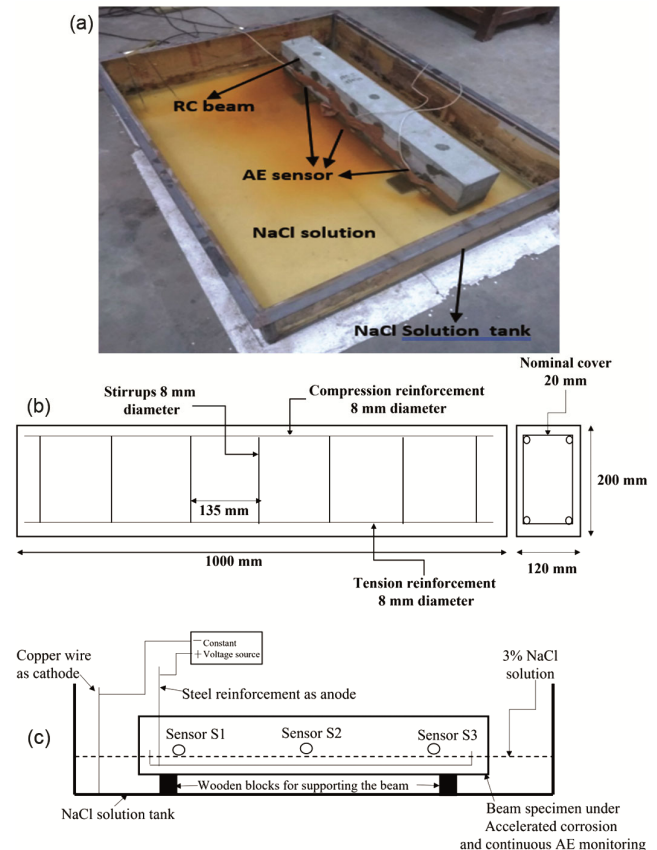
(a) Accelerated corrosion test arrangement, (b) Reinforcement detailing of test specimen and (c) Schematic representation of accelerated corrosion test setup and the depth dimension of the amount of beam in the NaCl solution is 50mm approximately.
